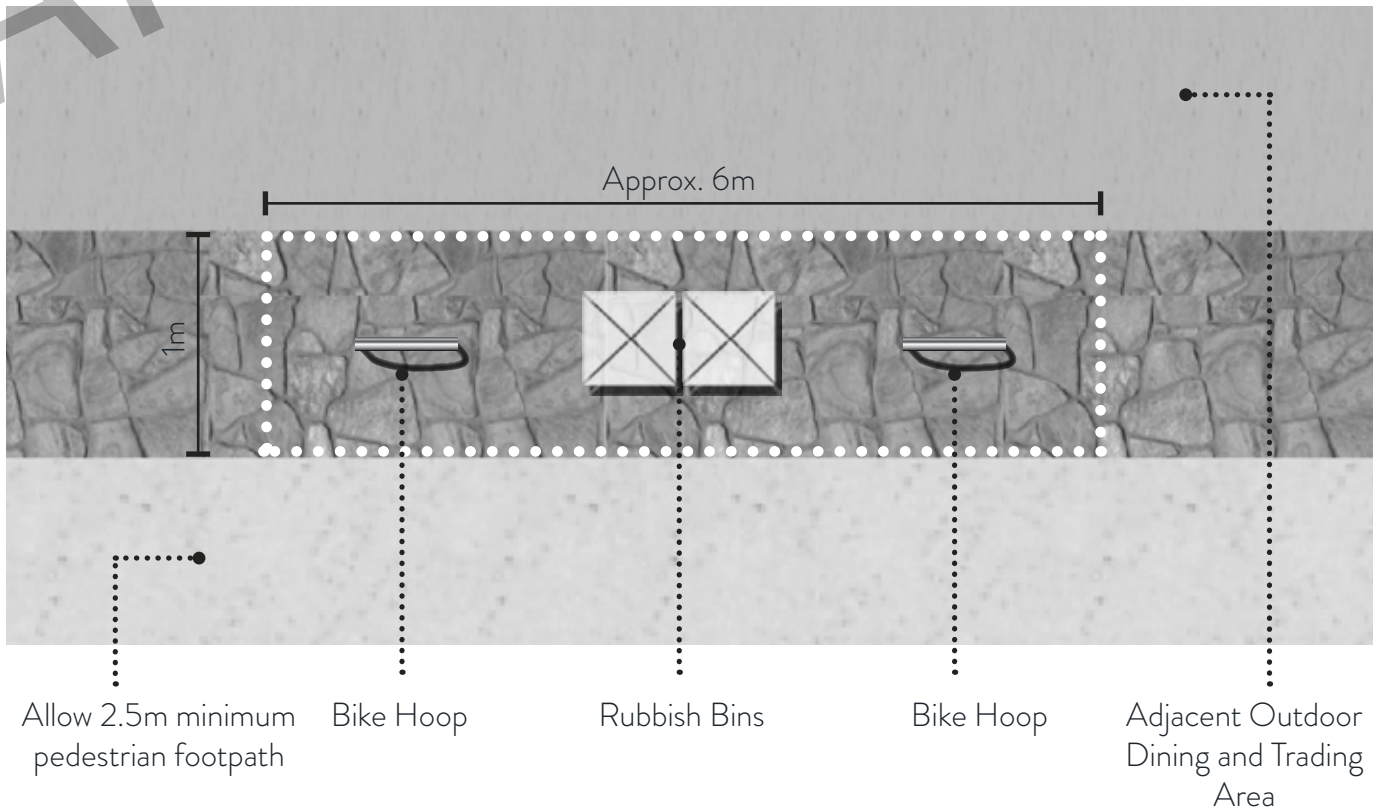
Furniture Arrangement Type 1 - Bike Hoops and Bins within the service area of the road cross section.
